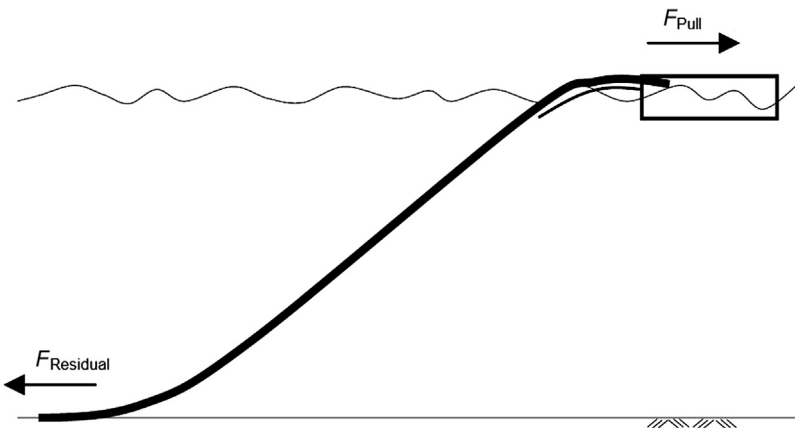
Pipeline horizontal loads in S-lay installation.
